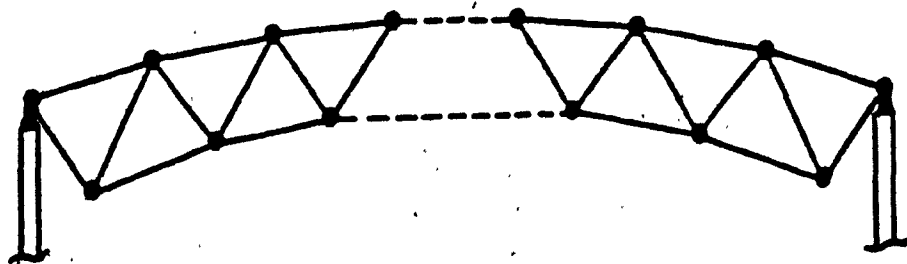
PROFILE OF A RING TRUSS WHICH IS SUPPORTED AT ITS UPPER SURFACE. THE TRUSS HAS VARYING DEPTH AND RISES ABOVE THE COLUMN HEIGHT.
